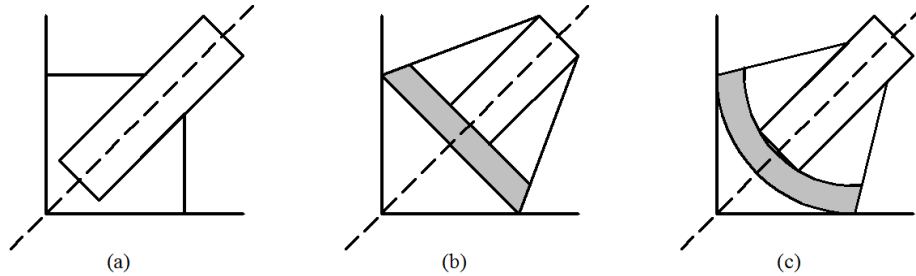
Diagram of connection types: (a) vintage CBF gusset plate without yield-line; (b) SCBF gusset plate with linear yield-line; and (c) SCBF gusset plate with elliptical yield-line.
